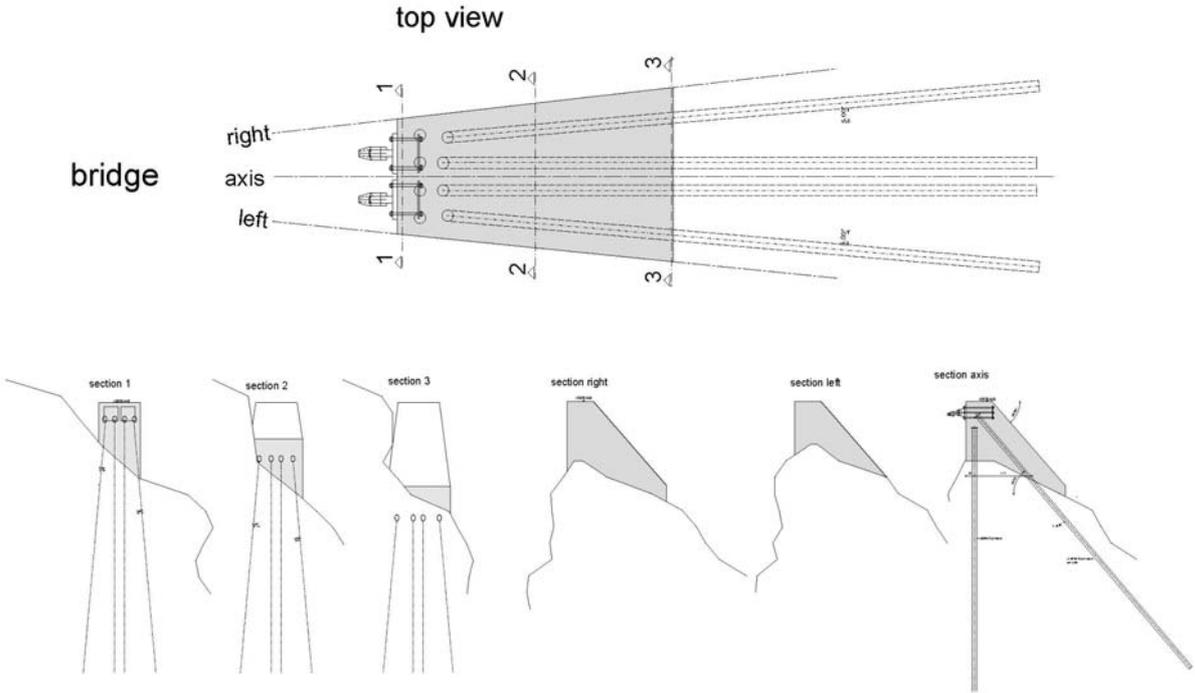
Formwork drawing anchoring point of suspension cable - western abutment
